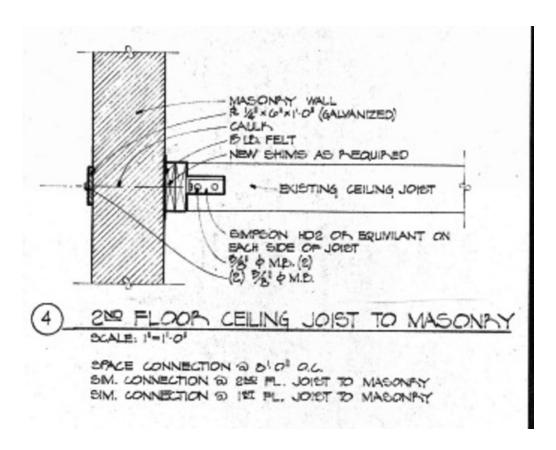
1975 retrofit detail for anchoring of brick wall
